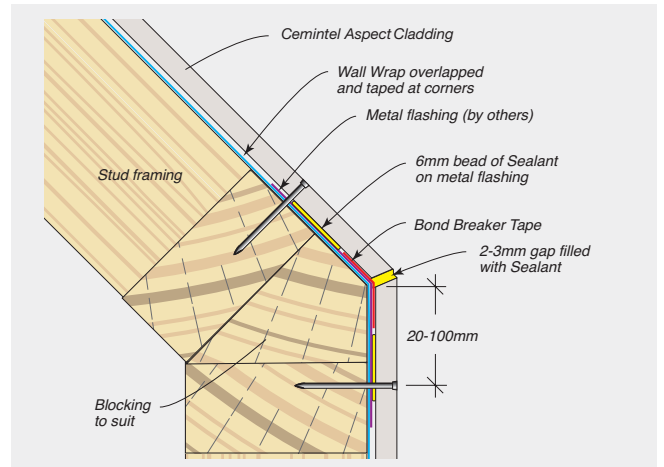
Junction of Aspect Cladding System with Alternative Fibre Cement Cladding – Plan View
